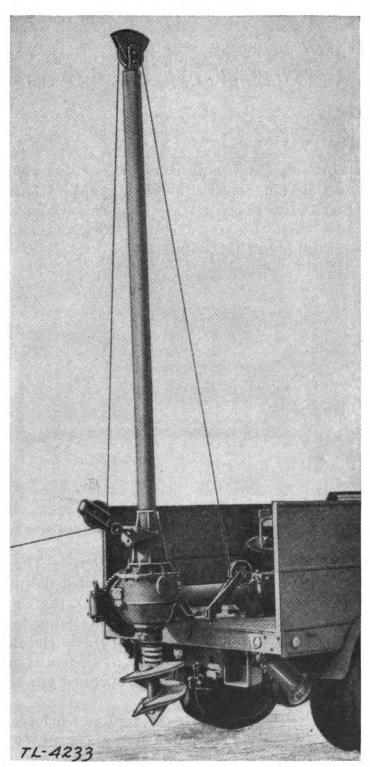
Earth borer equipment HD, hook-up of winch cable to pull pole up to machine.
